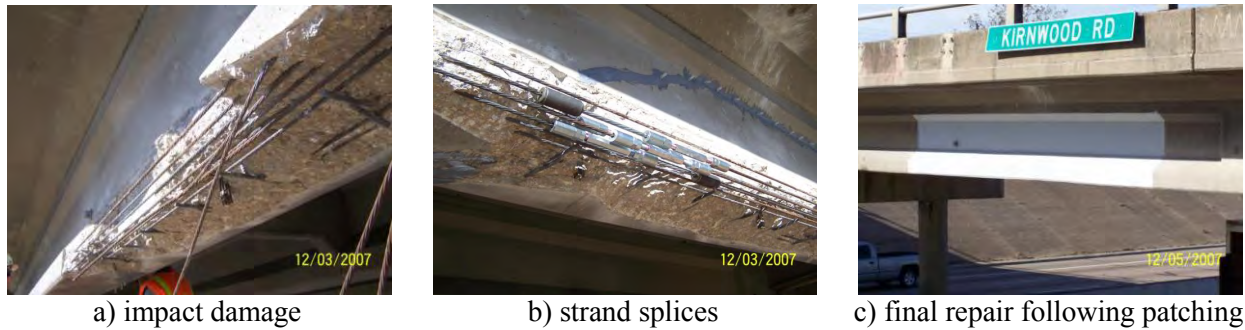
Strand splice repair of exterior AASHTO I-girder.
